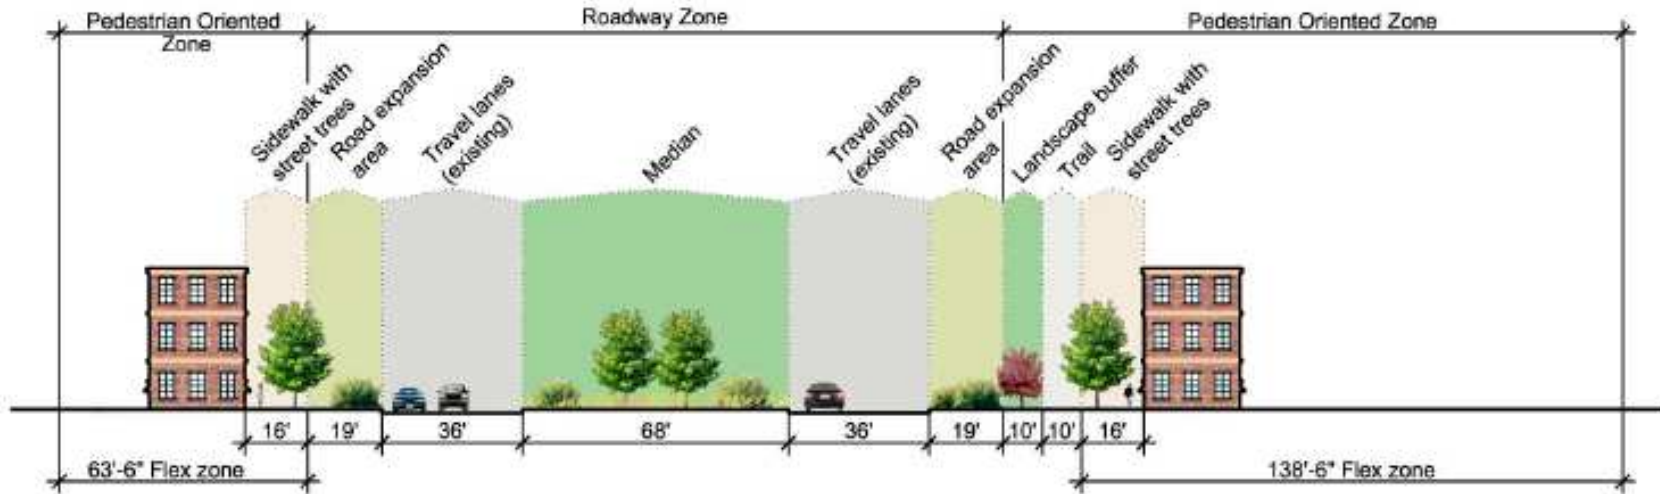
Section B: Corridor Area & Intersections (200' wide)
